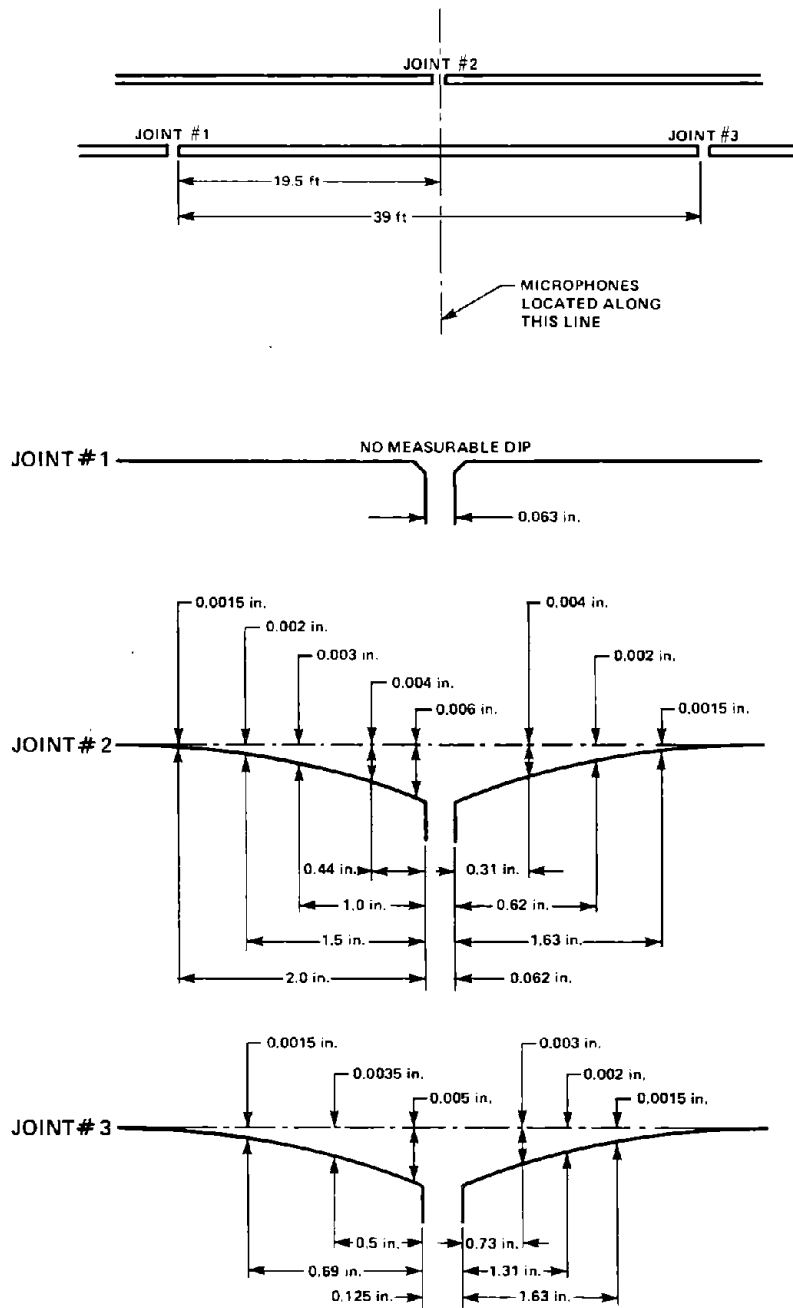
RAIL JOINT GEOMETRY AT THE TEST SECTION.
